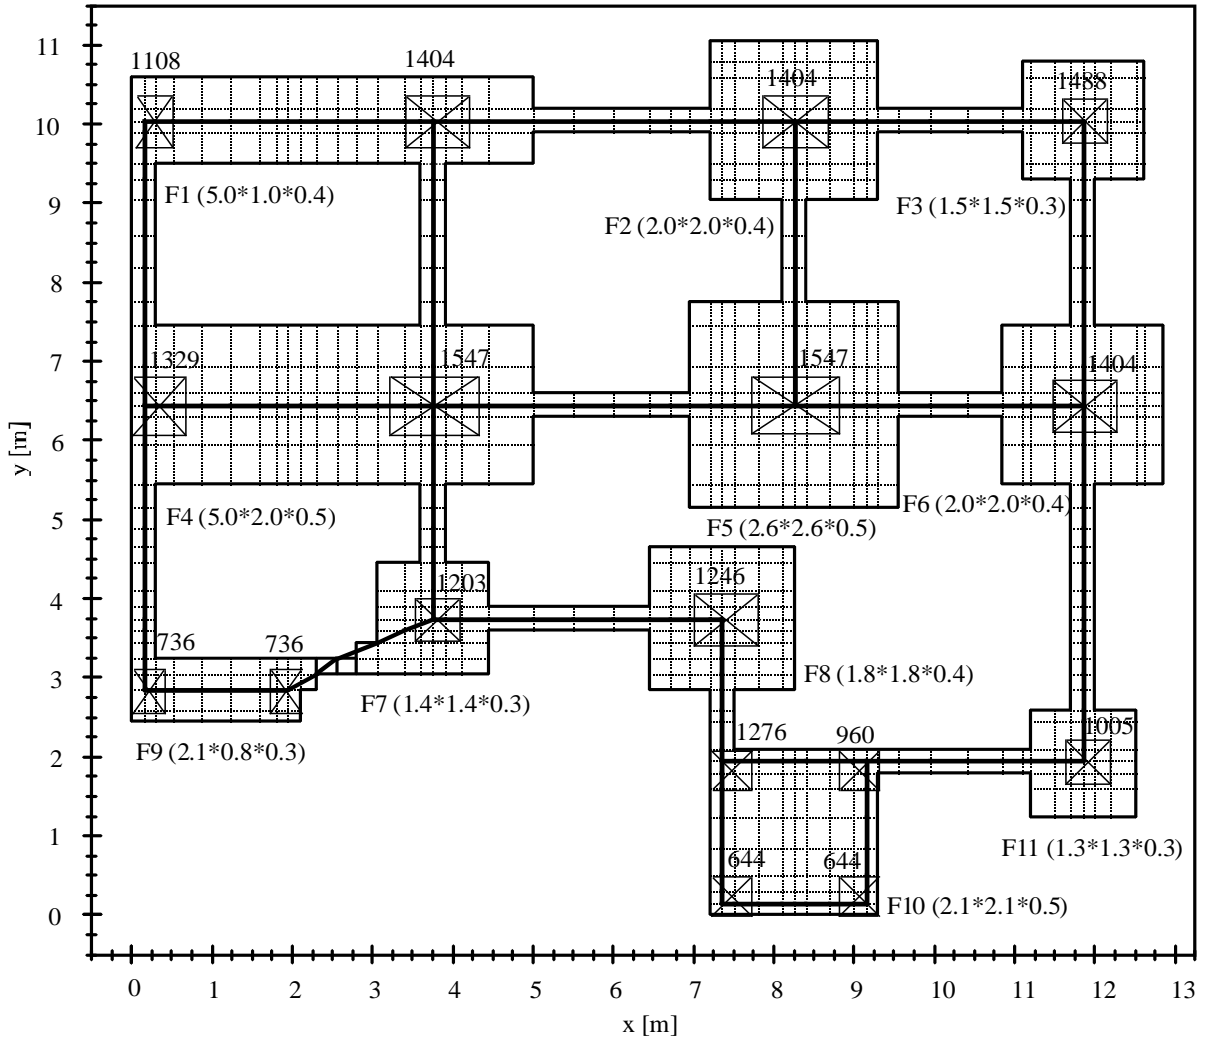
FE-Net of footings with tie beams, loads [kN/m²] and footing dimensions [m]
